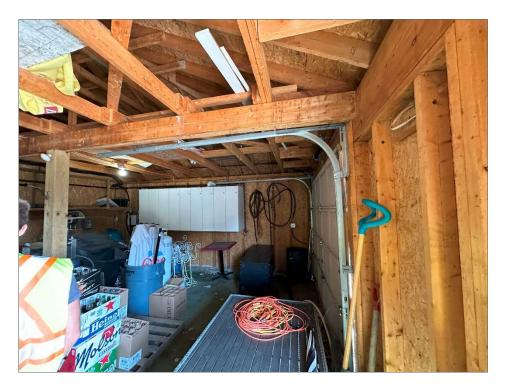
Interior of the eastern end of the Grillhouse, looking northwest.
